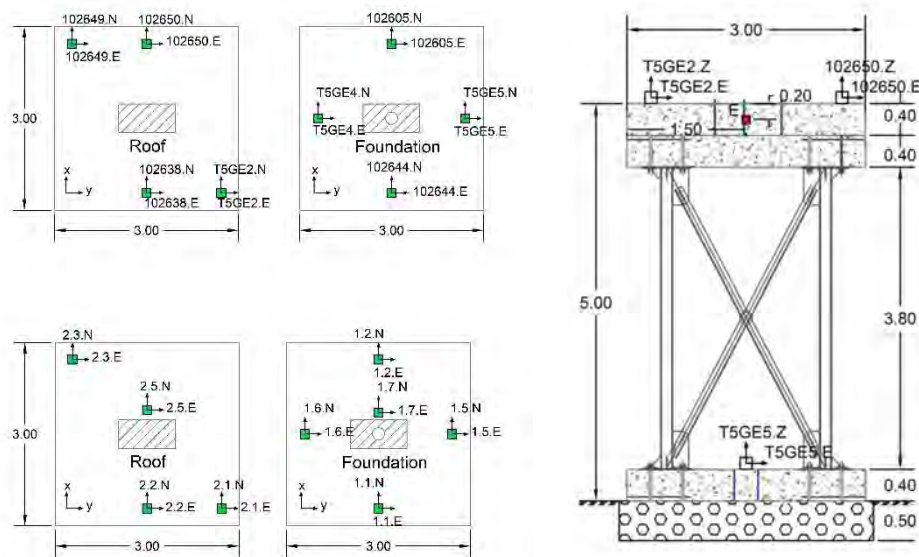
Plan view of the instrumentation layout of the roof and the foundation during the experiments performed on the natural soil (bottom left) and after replacing it with GRM (upper left) and cross-section of the structure and the GRM foundation
